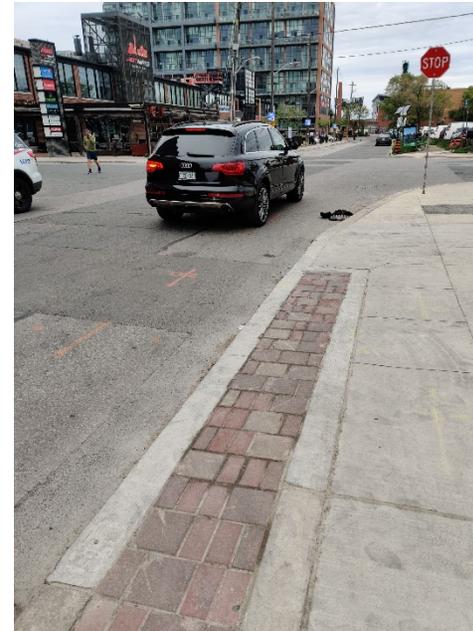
Hanna Ave/East Liberty St intersection (looking south)
